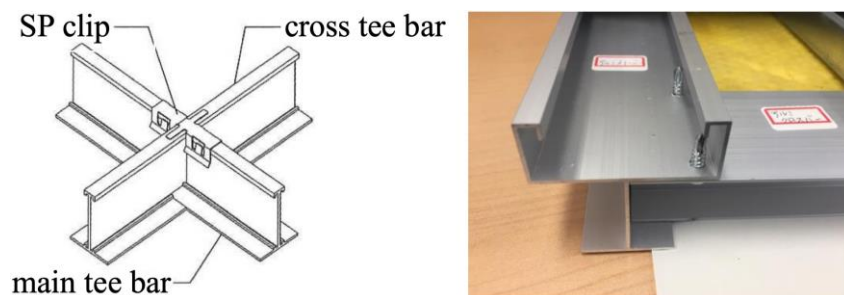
Ceiling substrates used in conventional integrated ceilings (left) and in new integrated ceilings (right)
